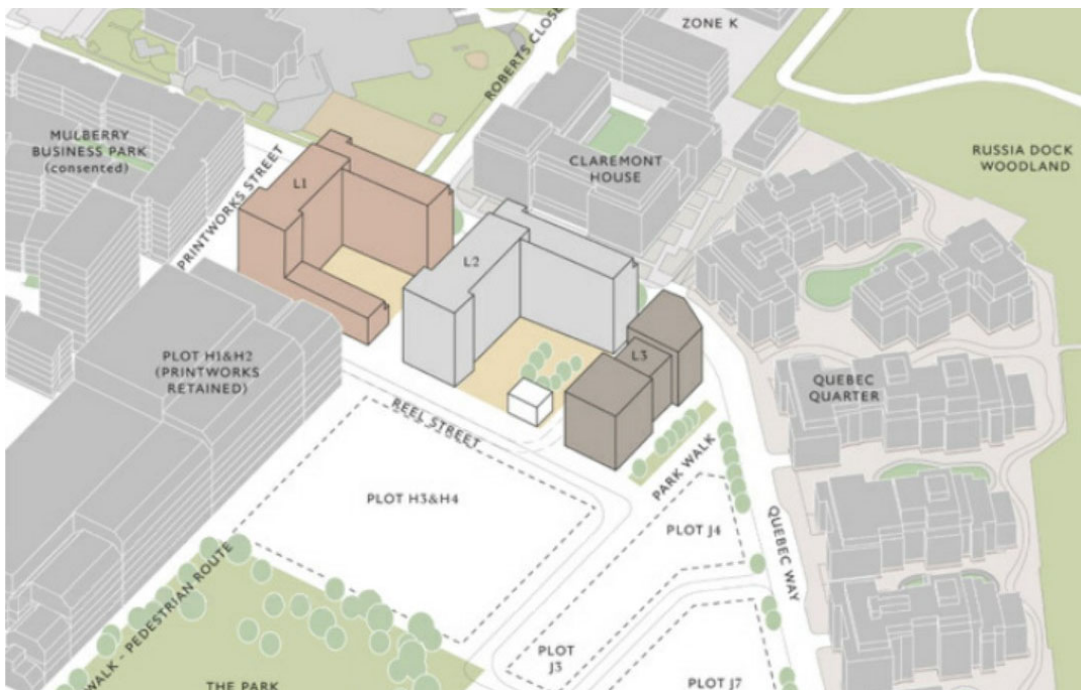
(above): Site diagram showing the arrangement of the three blocks that make up Zone L. The small white block between L2 and L3 is the substation.
